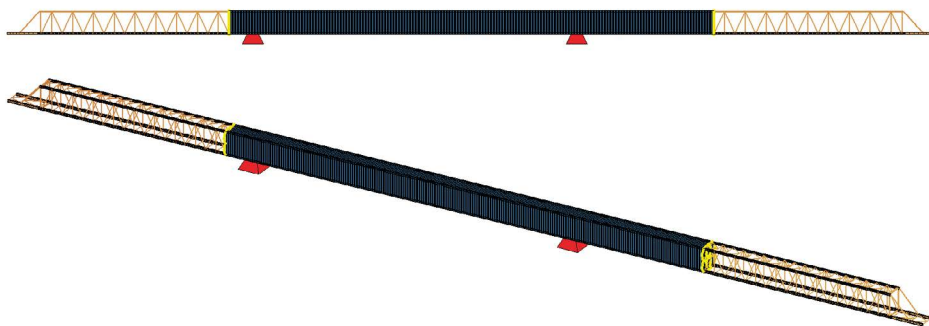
Modeling approach 2: Beam elements for the cross-section of each box module and truss components.
